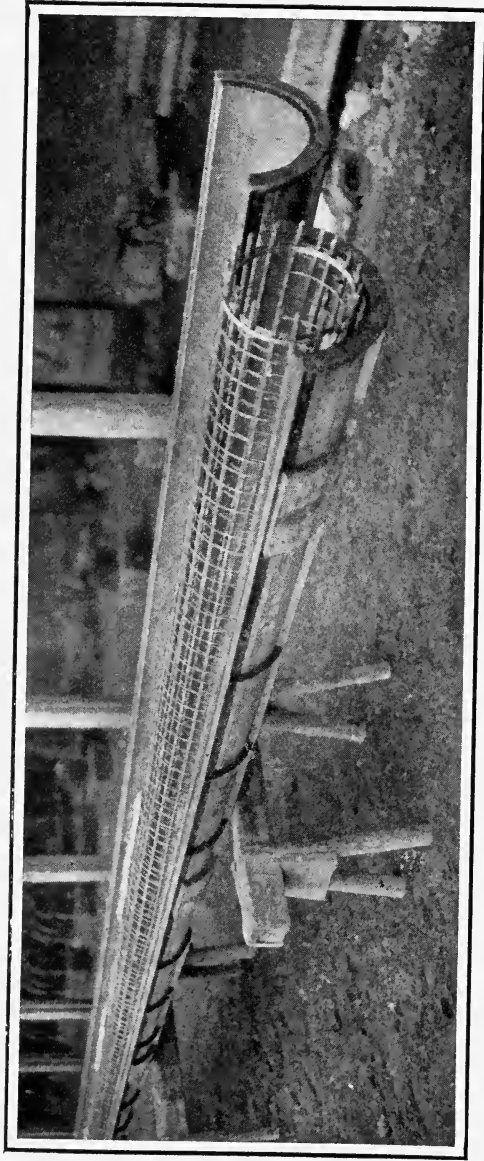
Form and reinforcing steel—centrifugal type concrete pole.
